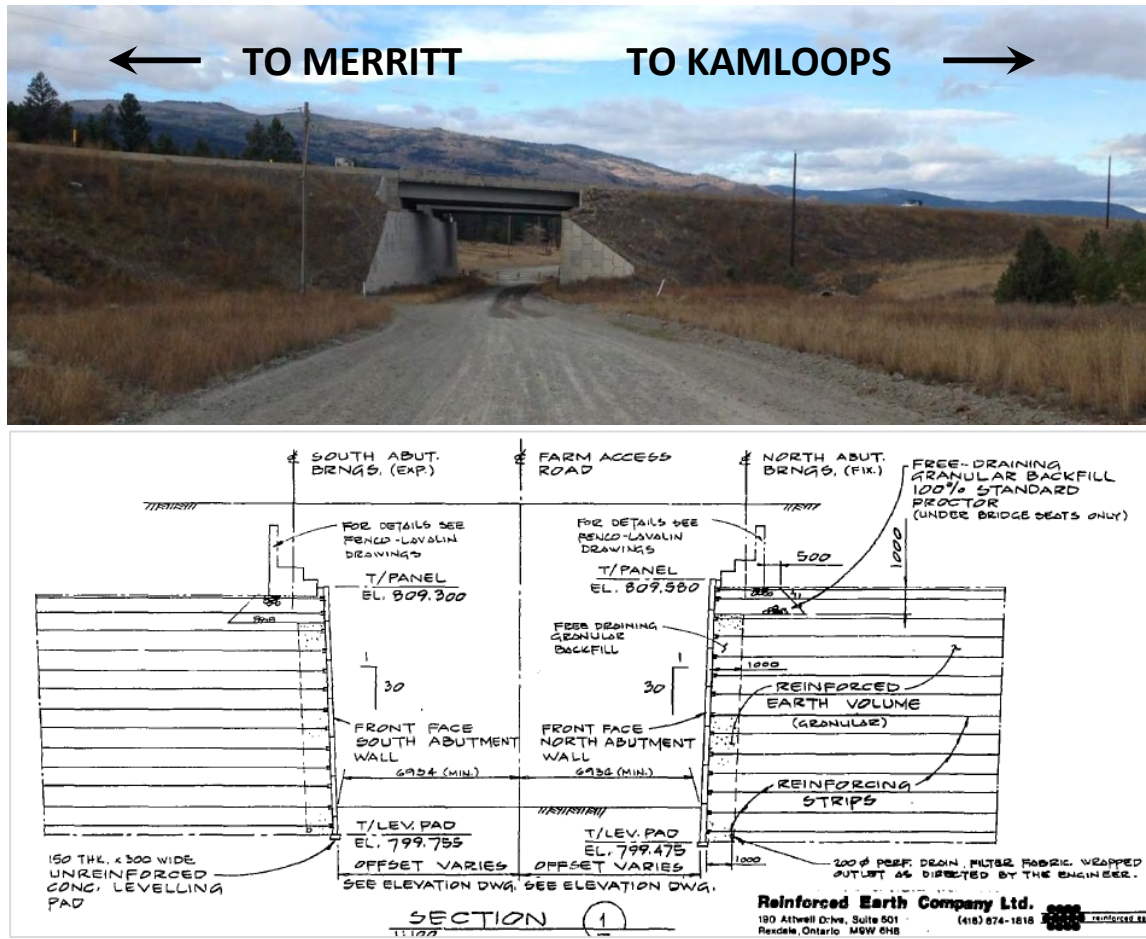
Existing Highway 5 AMAR Underpass - Elevation Photo & Cross-Section
